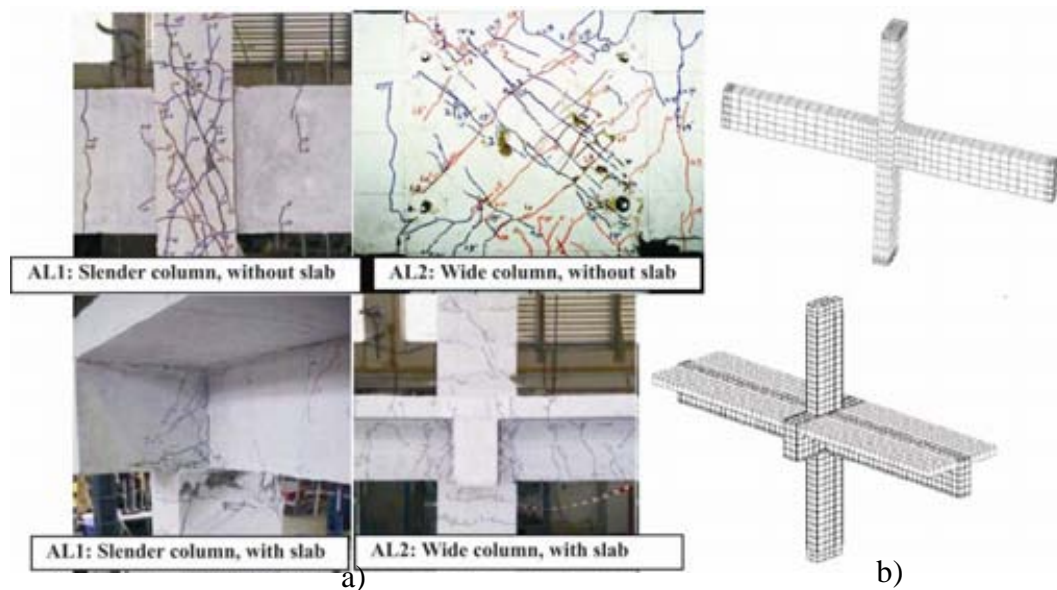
Interior beam-column joint with and without floor slabs: a) experimental damage pattern for slender and wide-column joints; b) FEM model of the interior beam-column joints [129].
